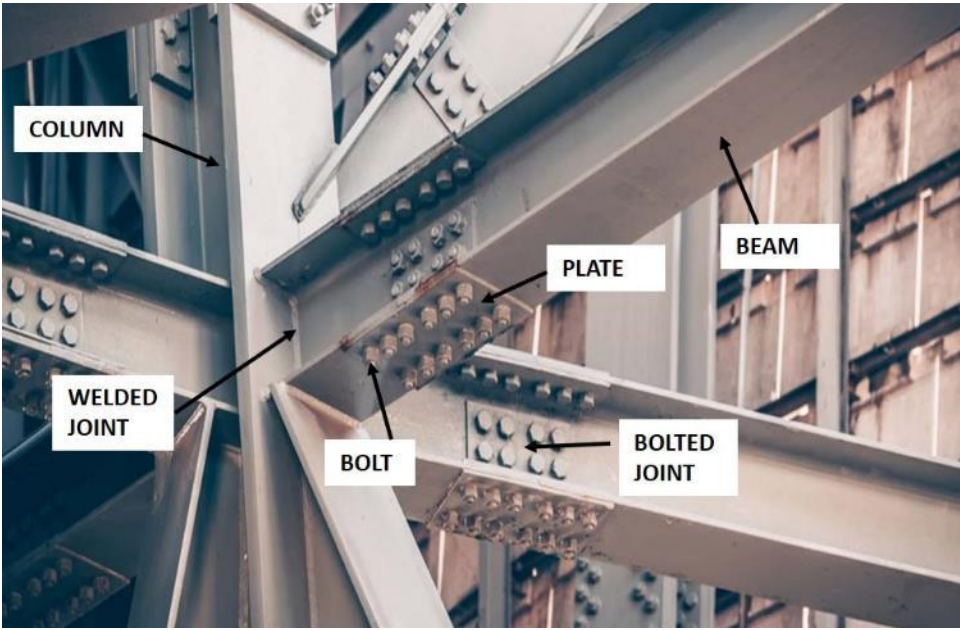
Example of welded and bolted connections of steel structural members – Source: [6]
